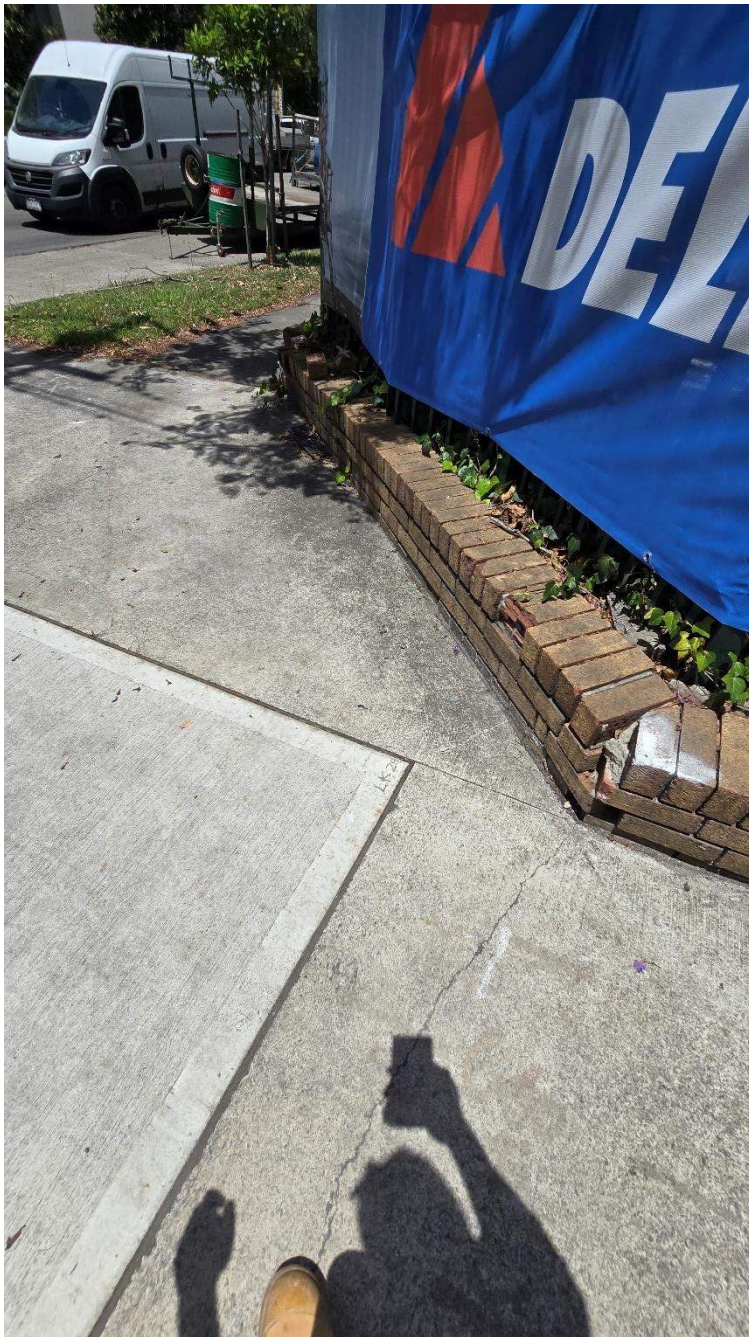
Cracks observed (22, 23) - Retaining wall leaning outwards
